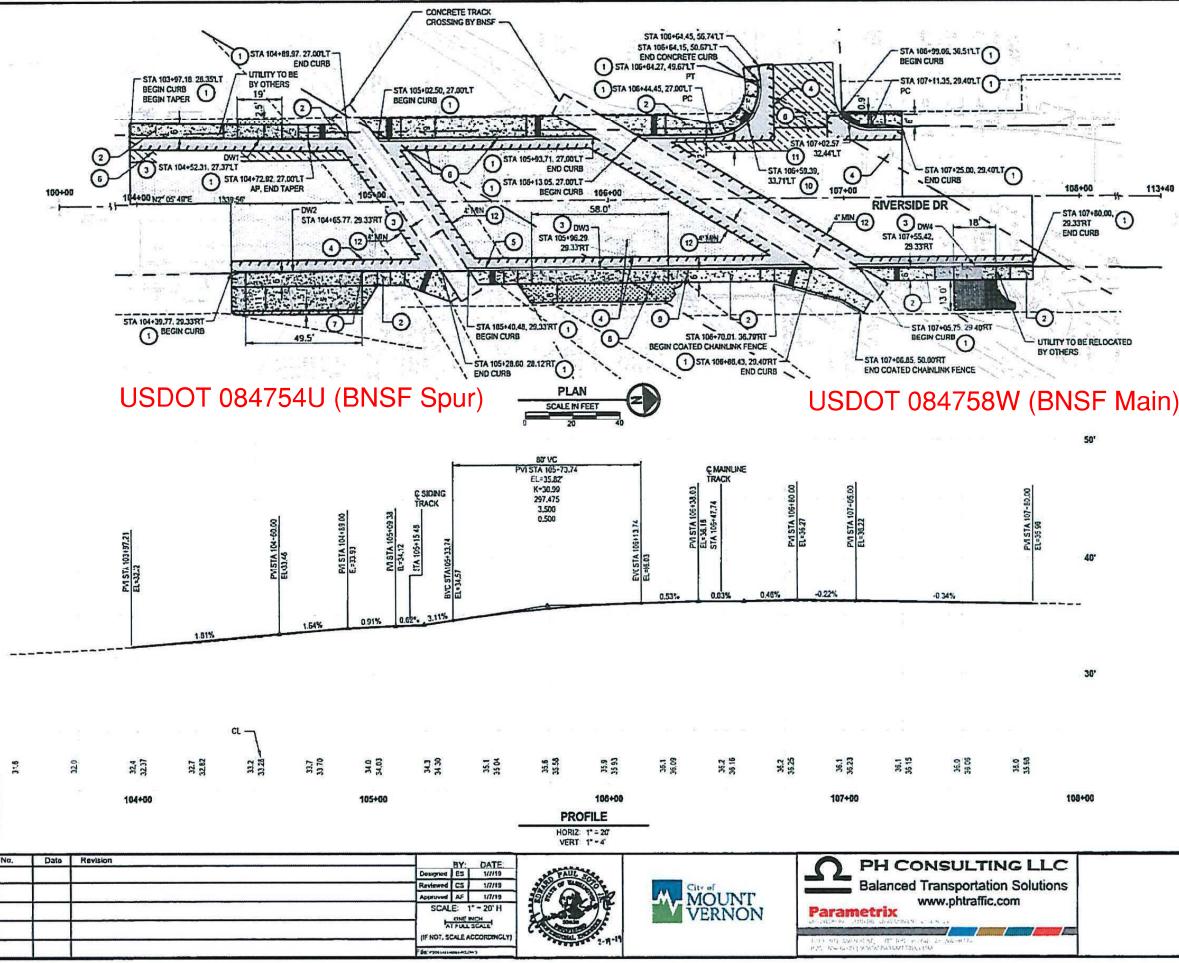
EXHIBIT B: Roadway, sidewalk, ADA ramps, Wayside horn system, pavement markings, signage, and track crossing surfaces.
